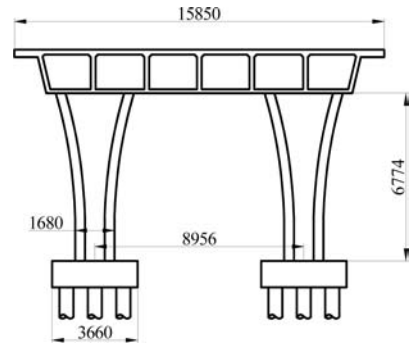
Elevation view of the prototype bridge in LJD02 (unit: mm).
